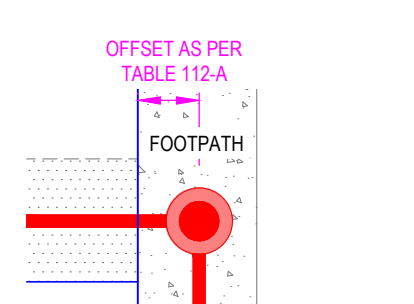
C4: SIDE AND ROAD RESERVE SEWER INTERSECTION
